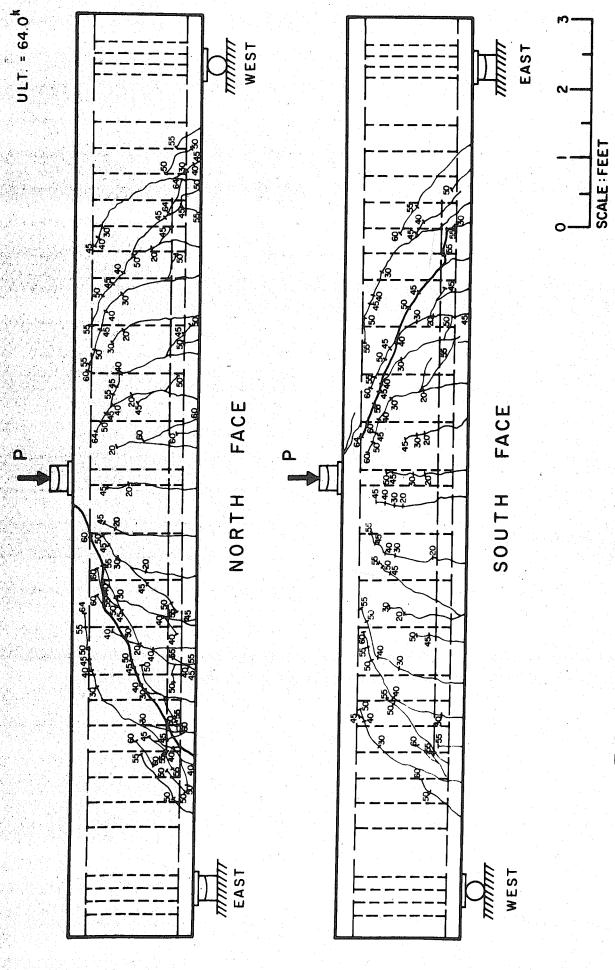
I BEAM I WCC-I CRACK PATTERN
